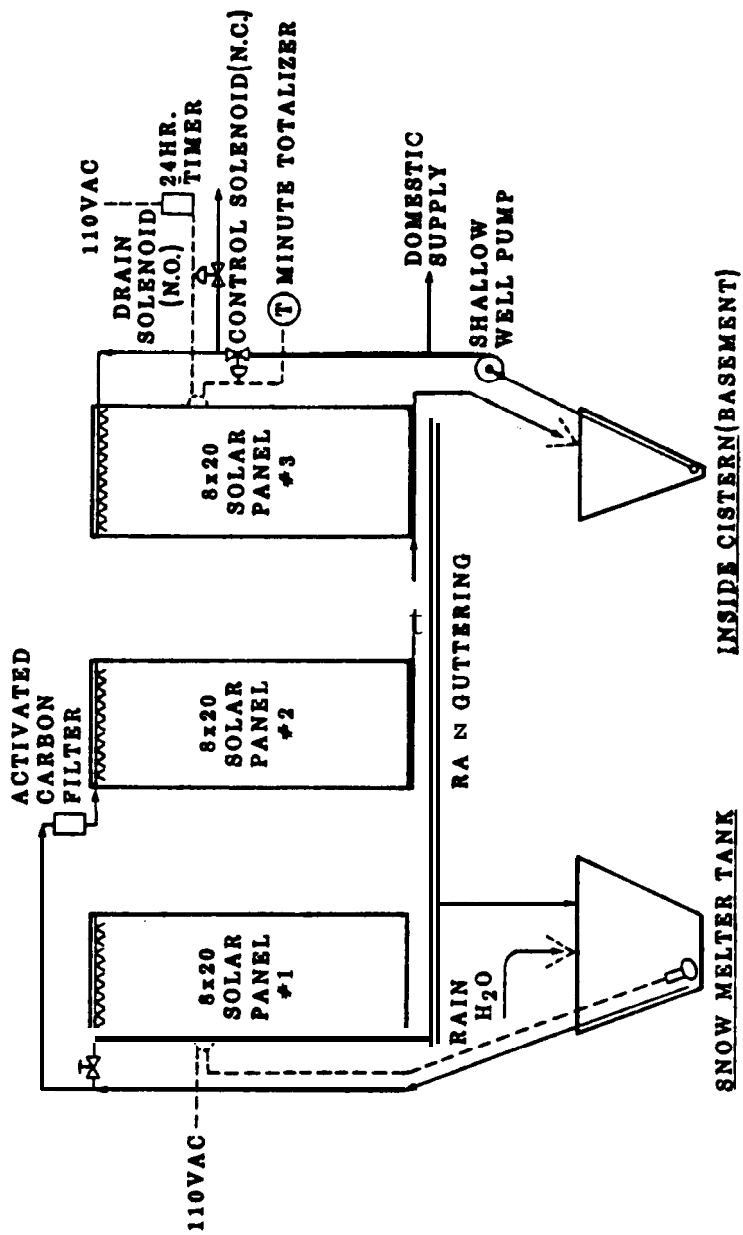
LAYOUT OF INSULATION COLLECTION SYSTEM
